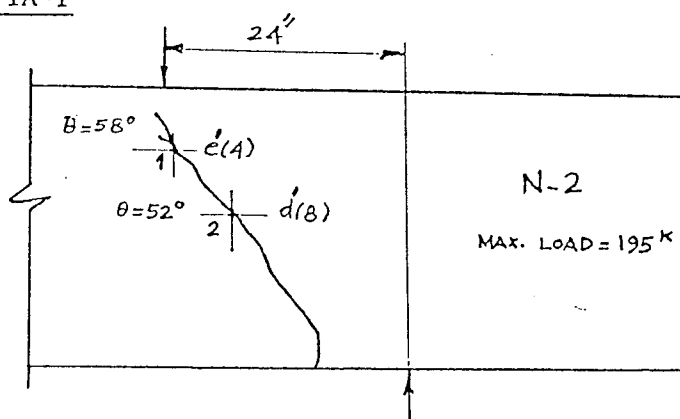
DEMEC ROSETTES AND DIAGONAL CRACK: BEAM IA-1
